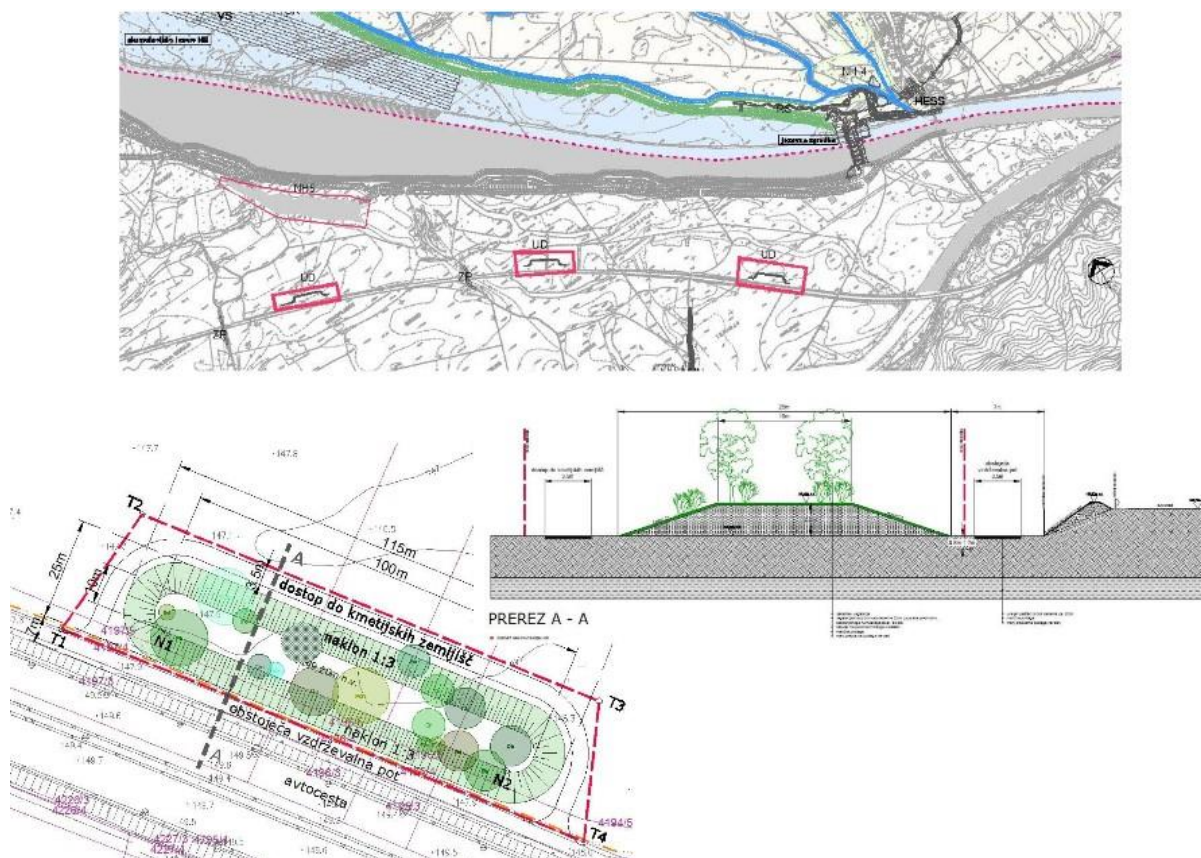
Plan for the construction of elevations for animals to retreat during floods<sup>59</sup>
